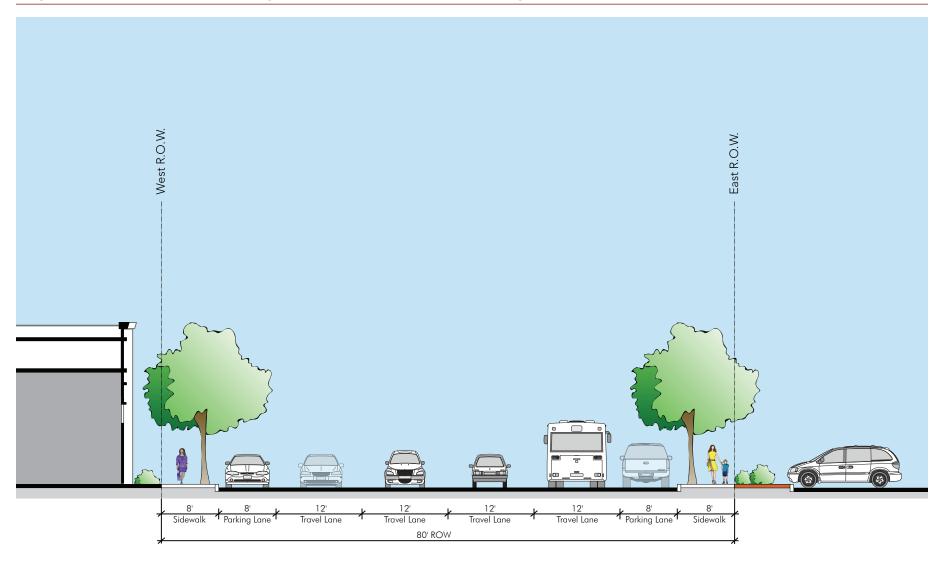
B: Highland Avenue Proposed Near Term Street Section (Northbound View)
